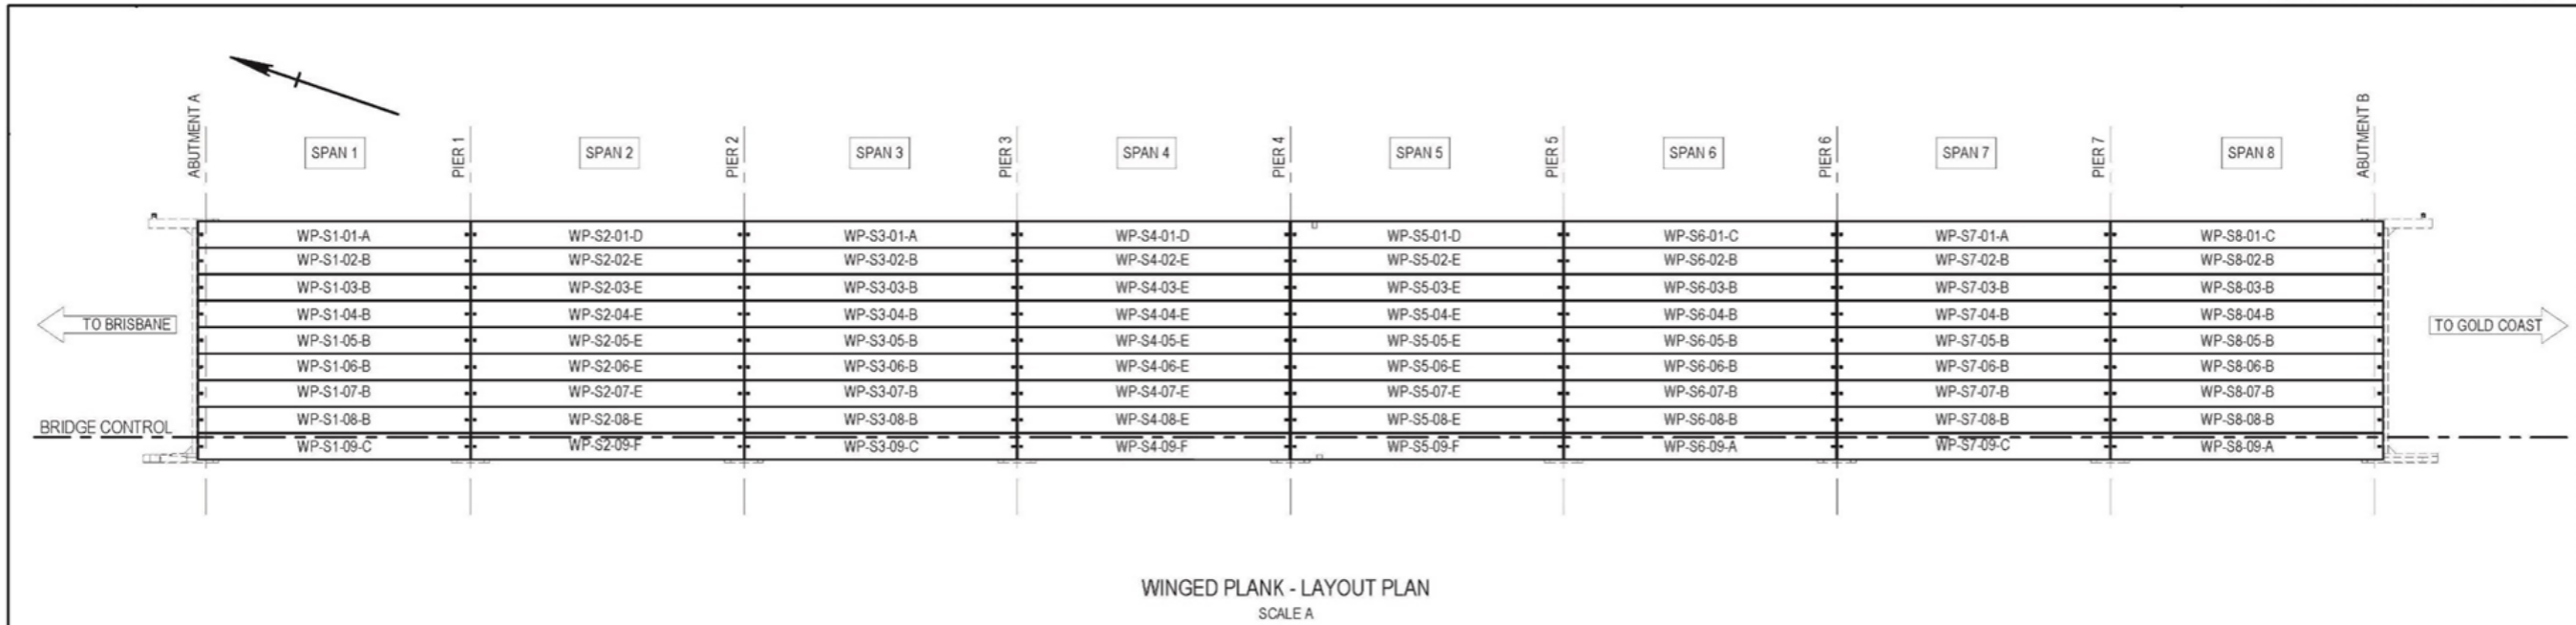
(j) - Example deck unit with reinforced concrete deck bridge drawings - Sheet 4
